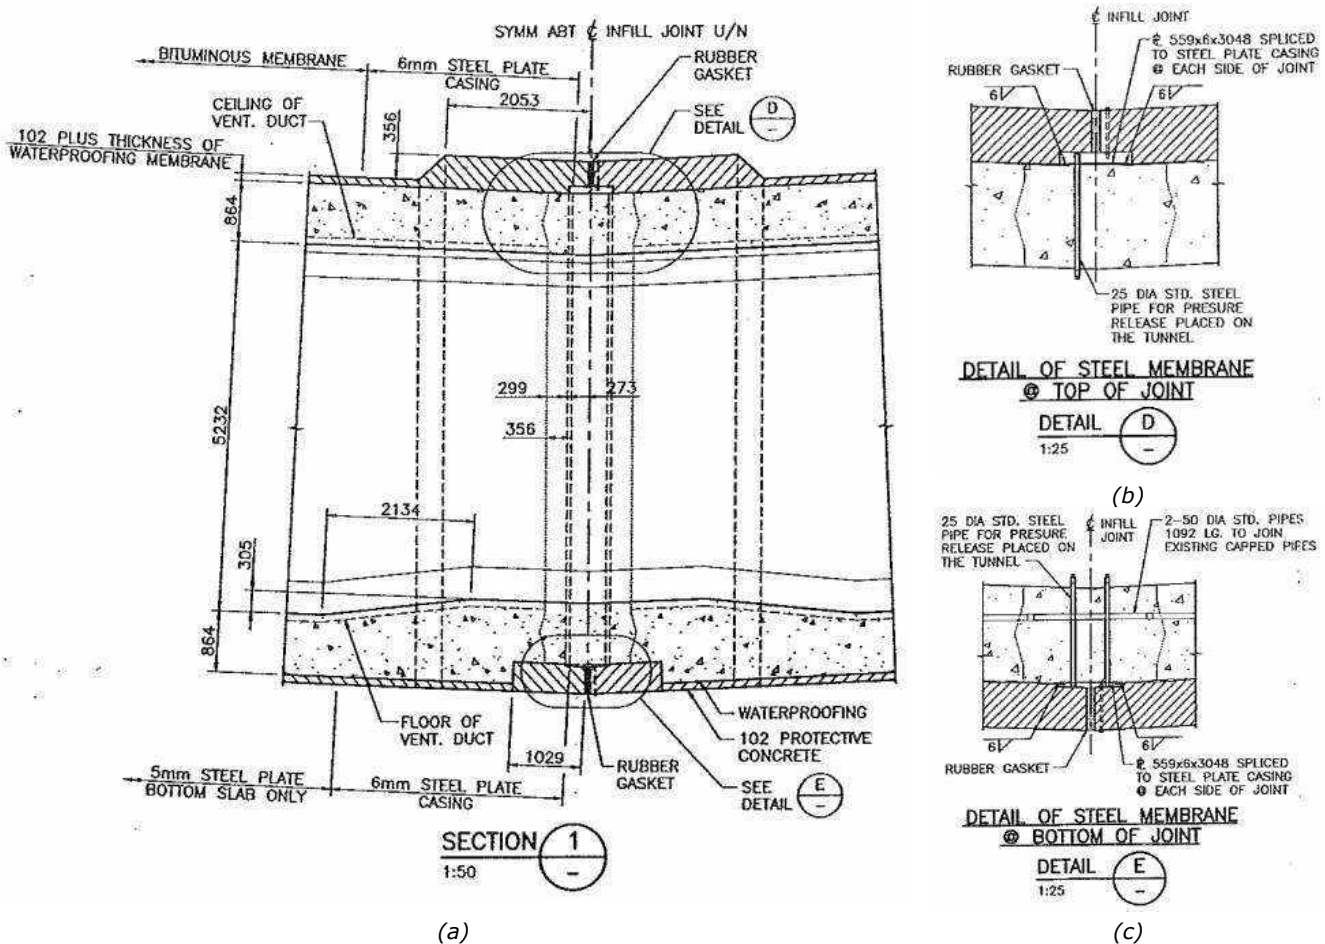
Waterproofing details at the infill joints for the immersed tunnel showing (a) the general arrangement of joints, (b) detail of steel membrane and infill
